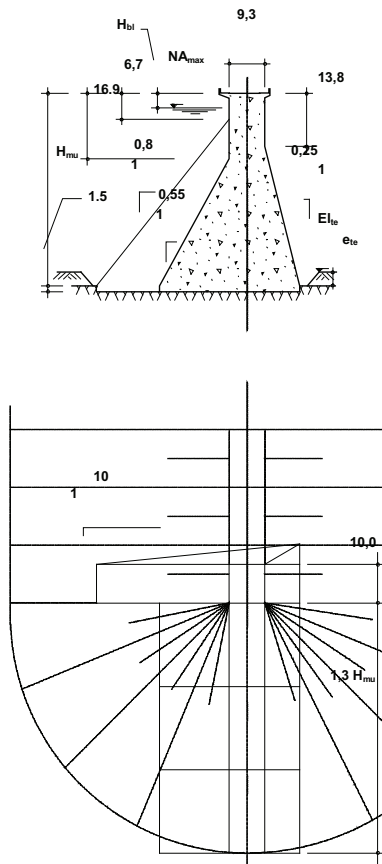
Typical cross-section of a transition wall.
